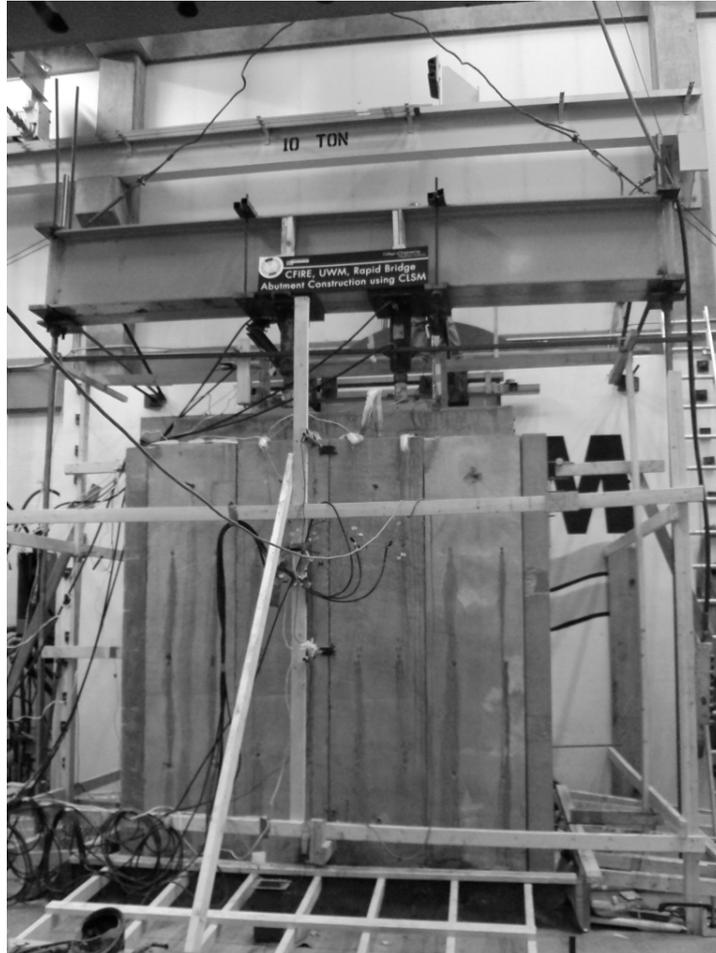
Large Scale CLSM Bridge Abutment Prior to Test
